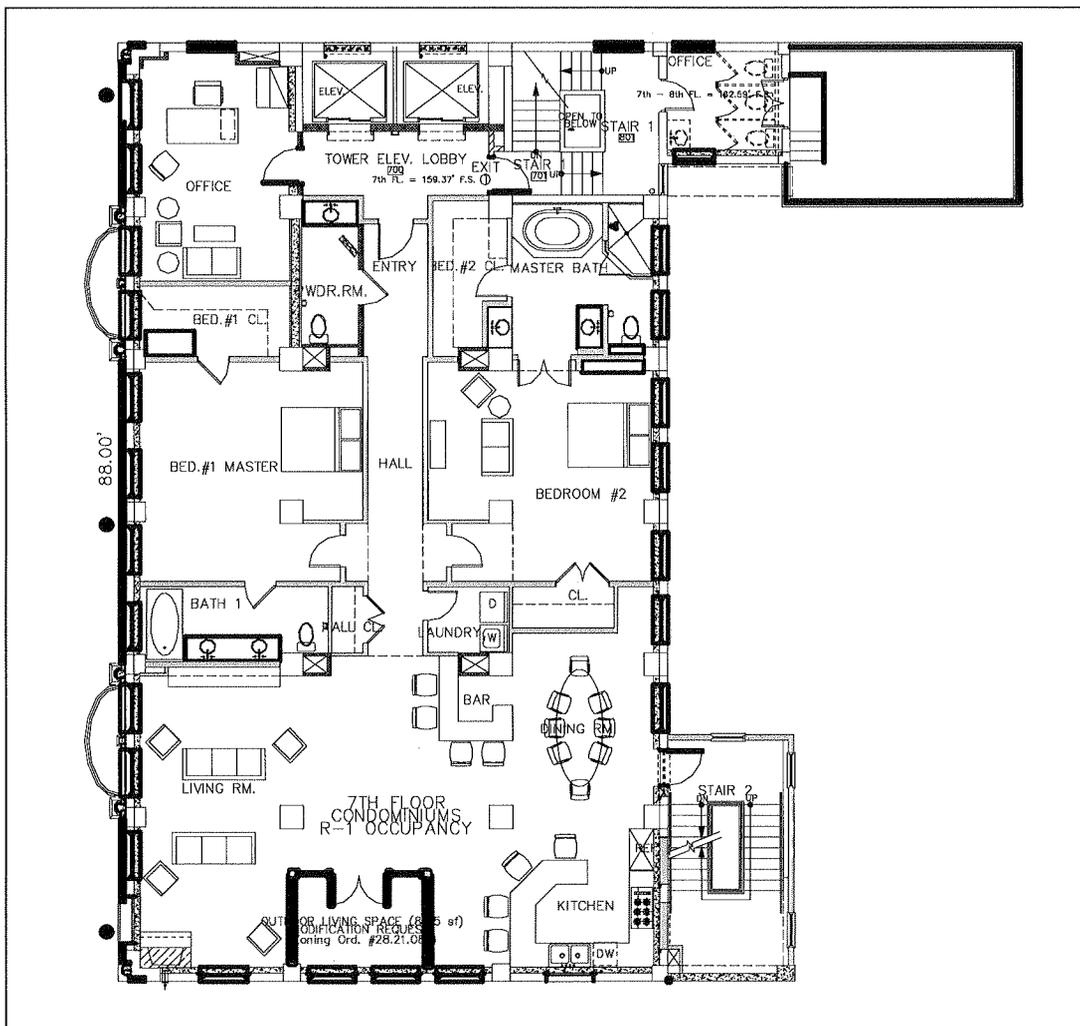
Seventh Floor Plan Showing Proposed Residential Facility and Outdoor Living Space Alcove
